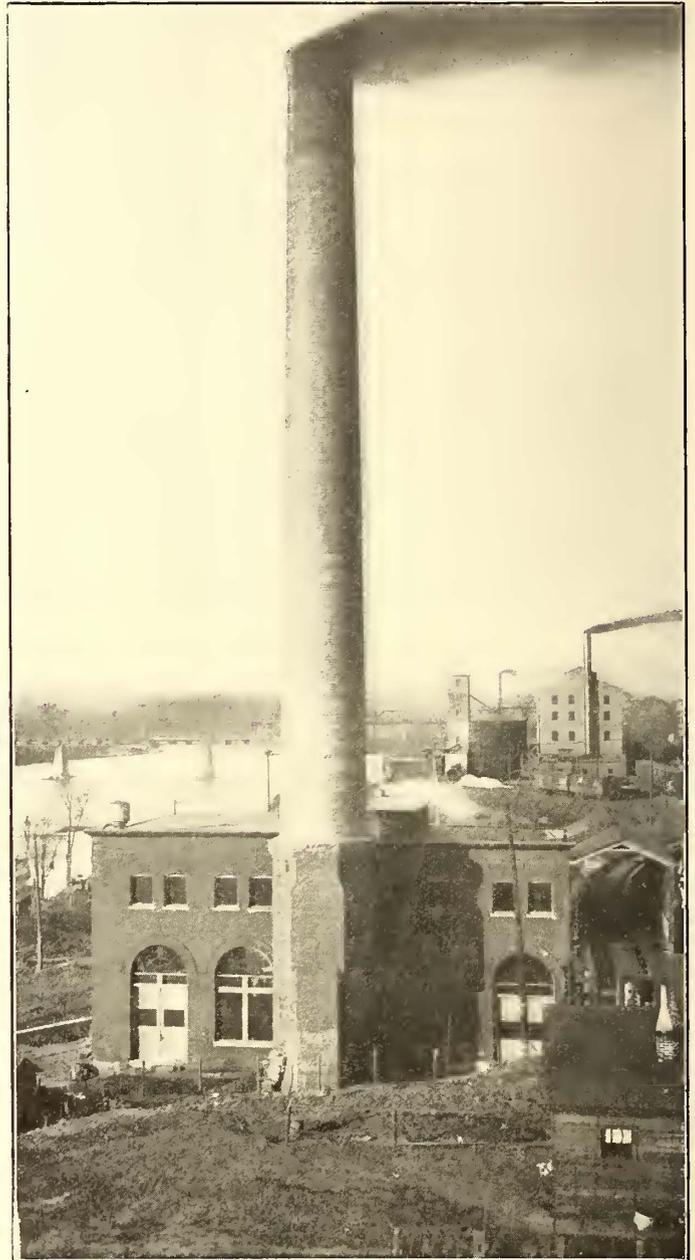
MULBERRY STREET STATION FROM THE SOUTH
